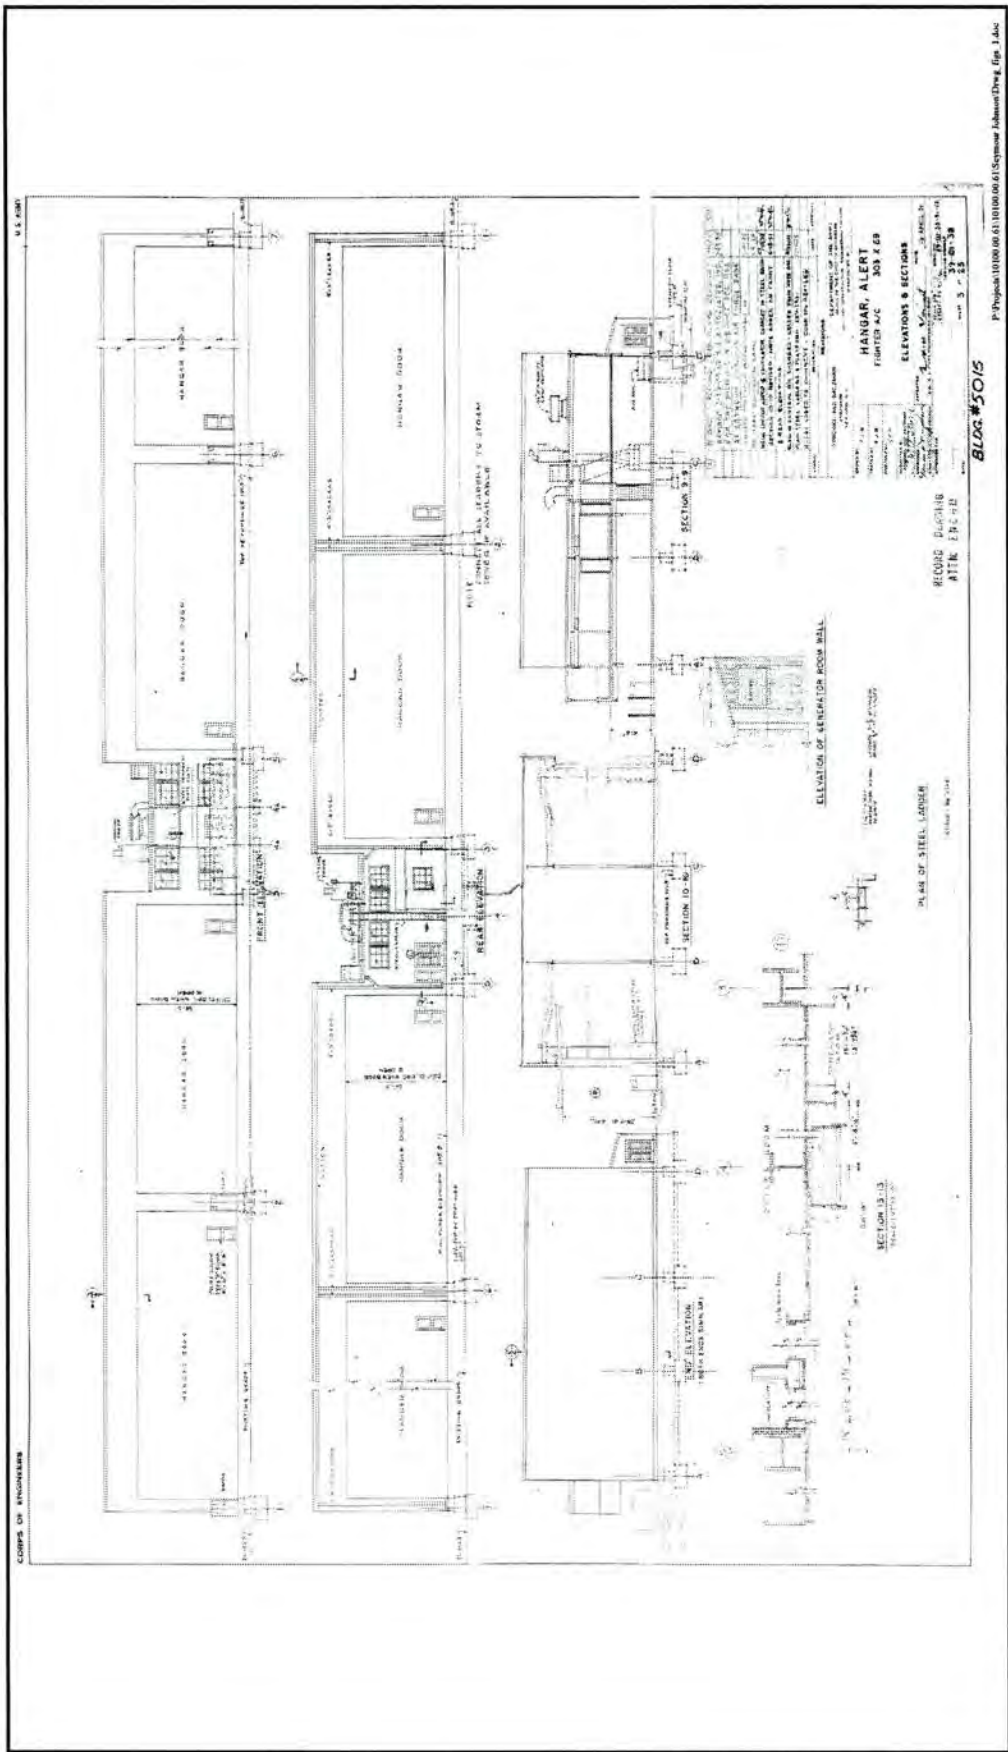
Building 5015—record drawing, elevations and sections, 1951 (Source: Seymour Johnson Air Force Base Civil Engineering Vault)
